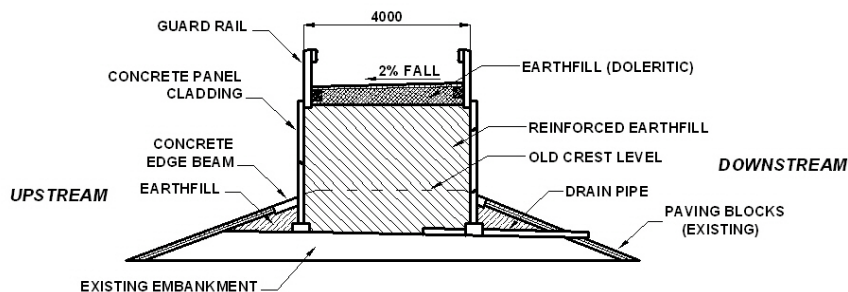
Gcuwa Dam: Typical Detail of MSE Crest
